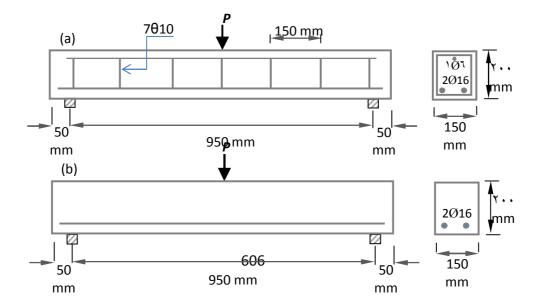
Loading arrangement, geometry and reinforcement detail for (a): Beam B1 , (b): All beams except beam B1
